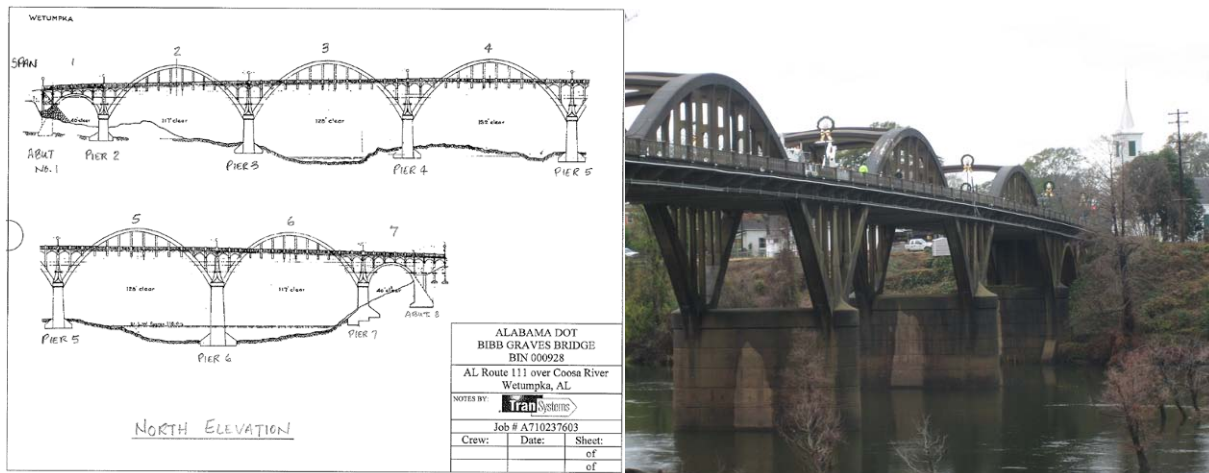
Sketch showing elevation and photograph of Bibb Graves Bridge (north face).
